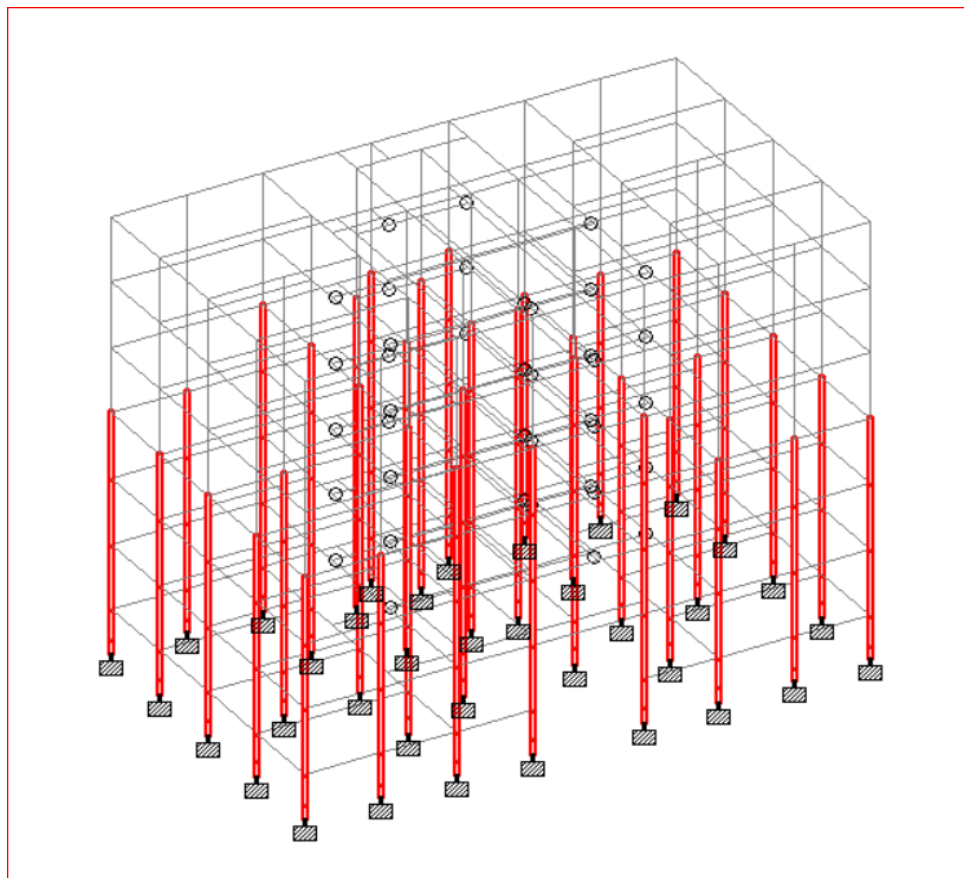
Retrofitted columns of G+5 RC building using STAAD-Pro.
